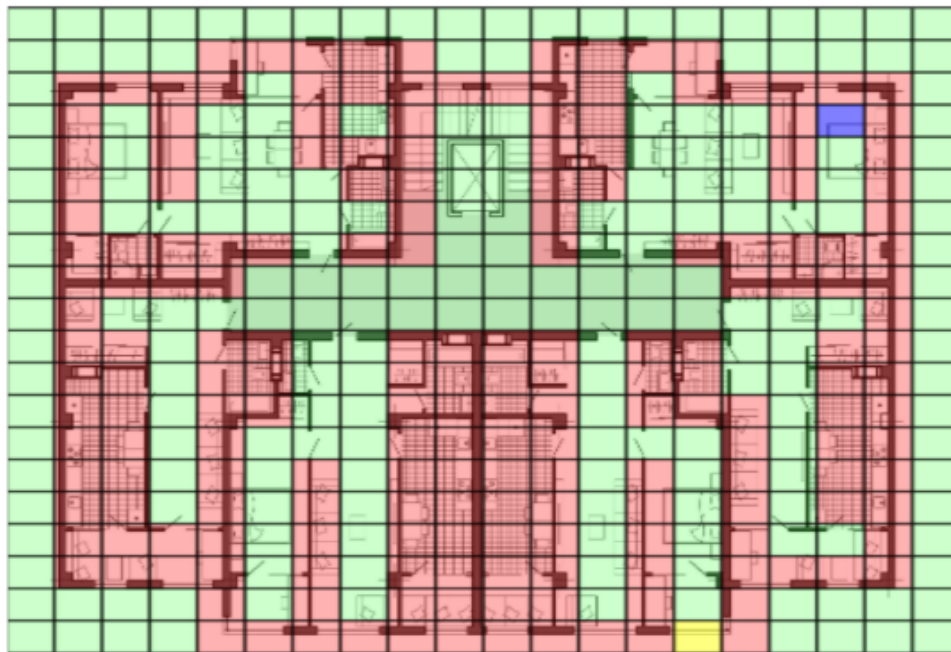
Complex Building Floor Plan Exit (Yellow) and Start position (Purple)
